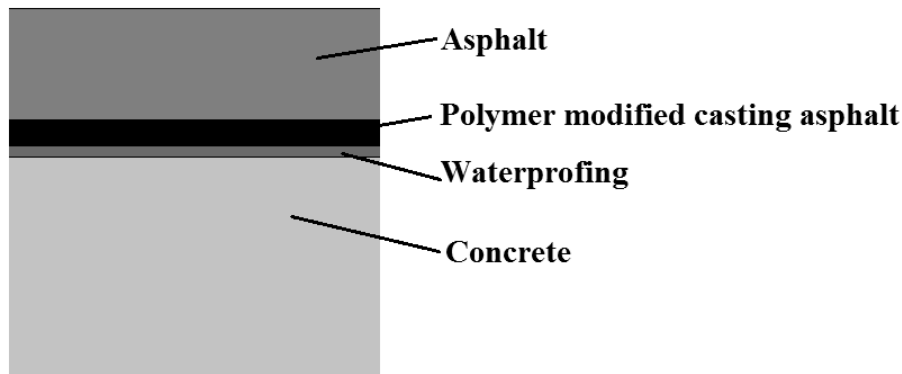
Typical cross-section of the surfacing on a concrete bridge deck
